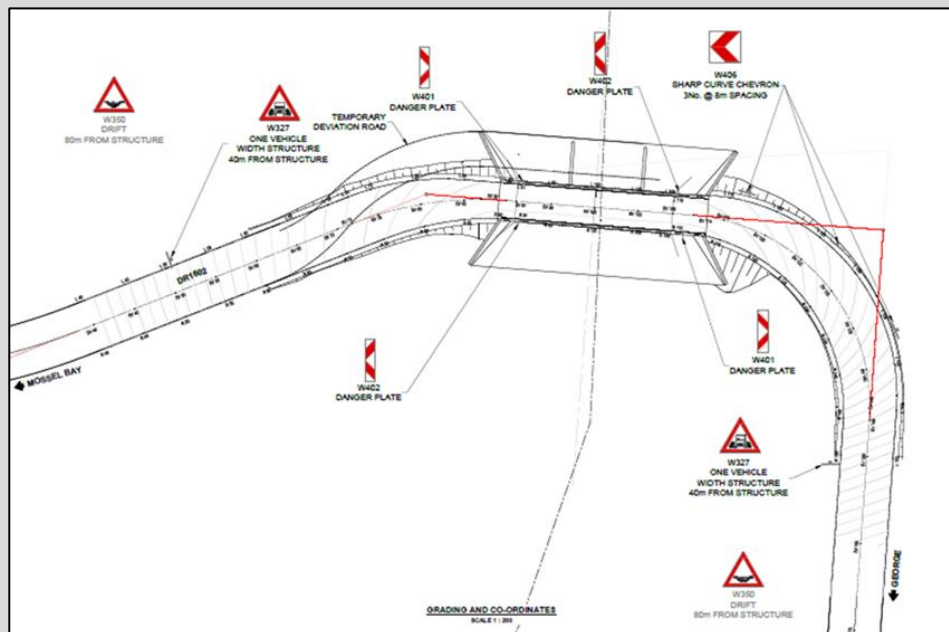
Area for the temporary traffic accommodation signs on the existing road, (Hatch Engineering, 2026).
